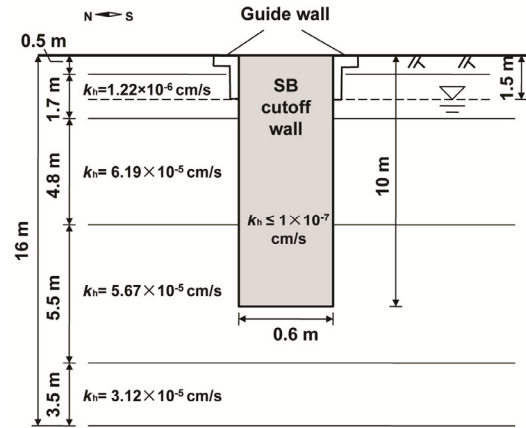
Cross-section of SB slurry trench cutoff wall in layered soils
